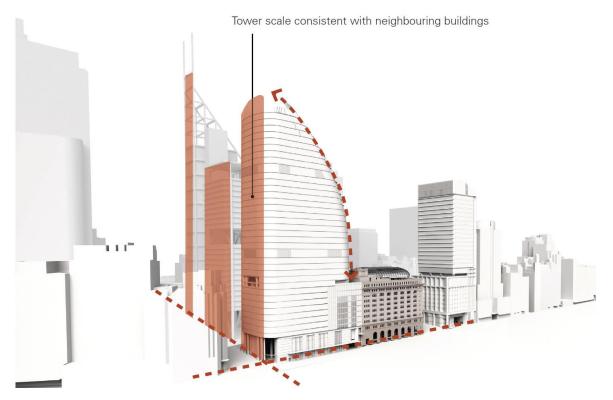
Alignment of towers fronting Hunter Street Source: JPW
